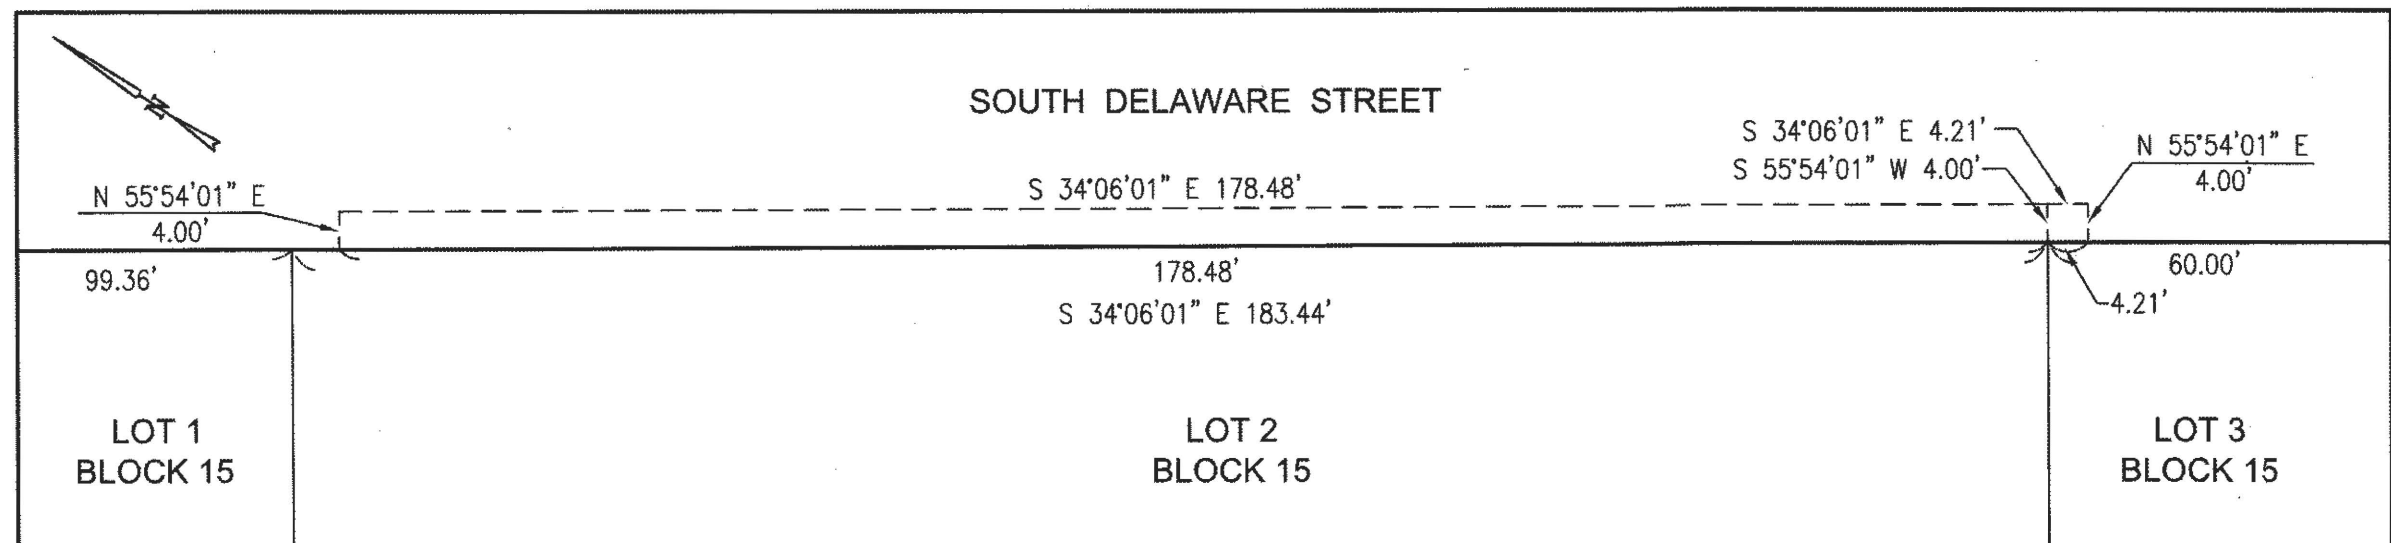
DETAIL 'C' - VERTICAL BUILDING RESERVATION (V.B.R.)
